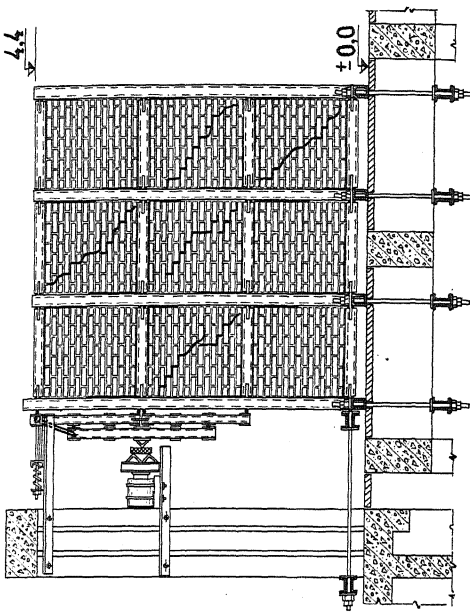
Scheme of testing brick cladding of 3-storey steel frame.
